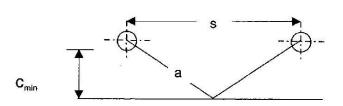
Distance from surface crack to centre of bar for slab or wall section
